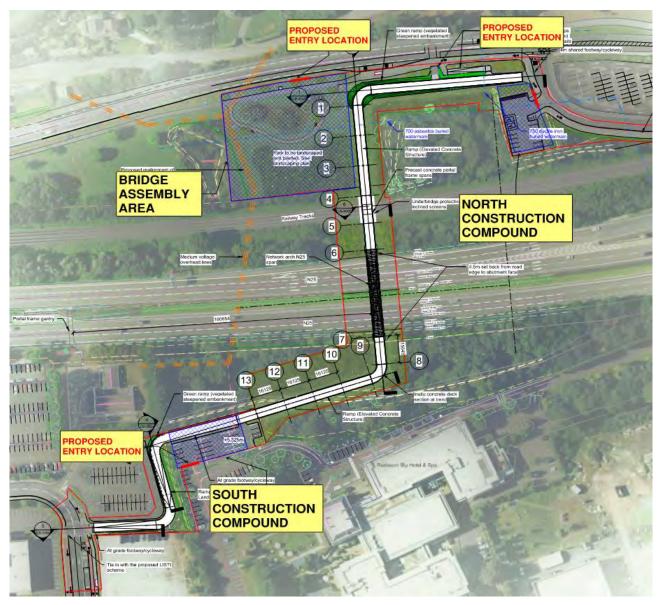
Extract of Proposed Development site layout, illustrating proposed construction compounds and bridge assembly area
